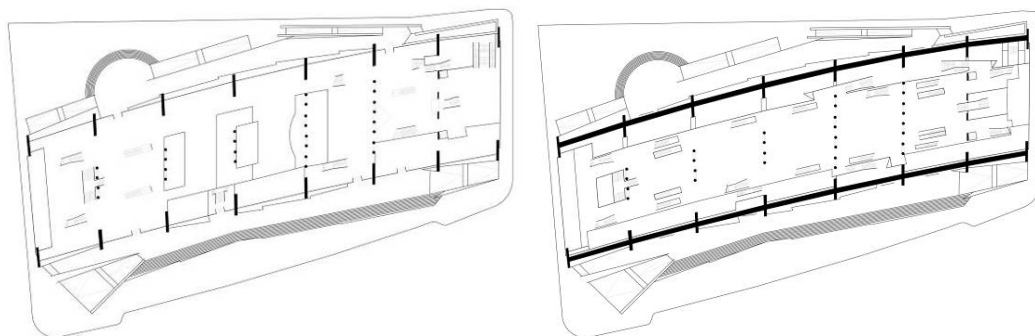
Interface of Entrecampos: floor plan of level 0 and 1
